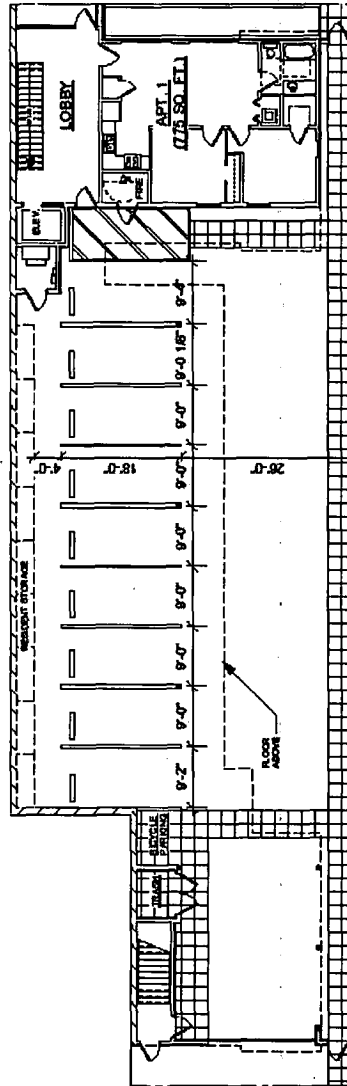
C – Floor Plans for Ground Floor/Second Floor
